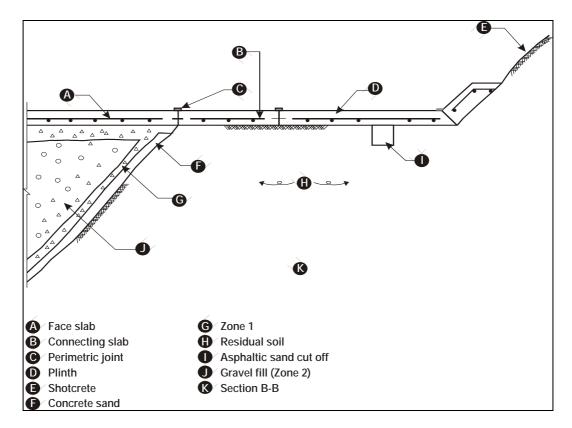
Salvajina Dam plinth founded on residual soil (Kleiner, 2005-e).
